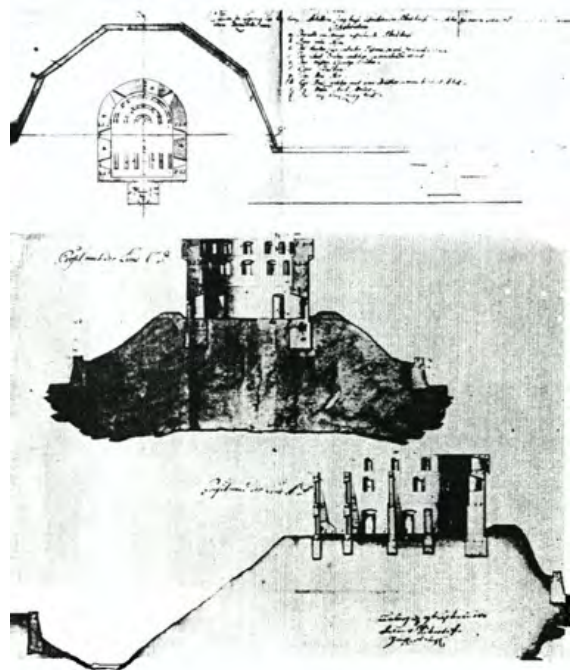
Drawings of the plan and transverse and longitudinal sections of the Powder Tower building since 1784 (the Lviv city archive [18: 165])
